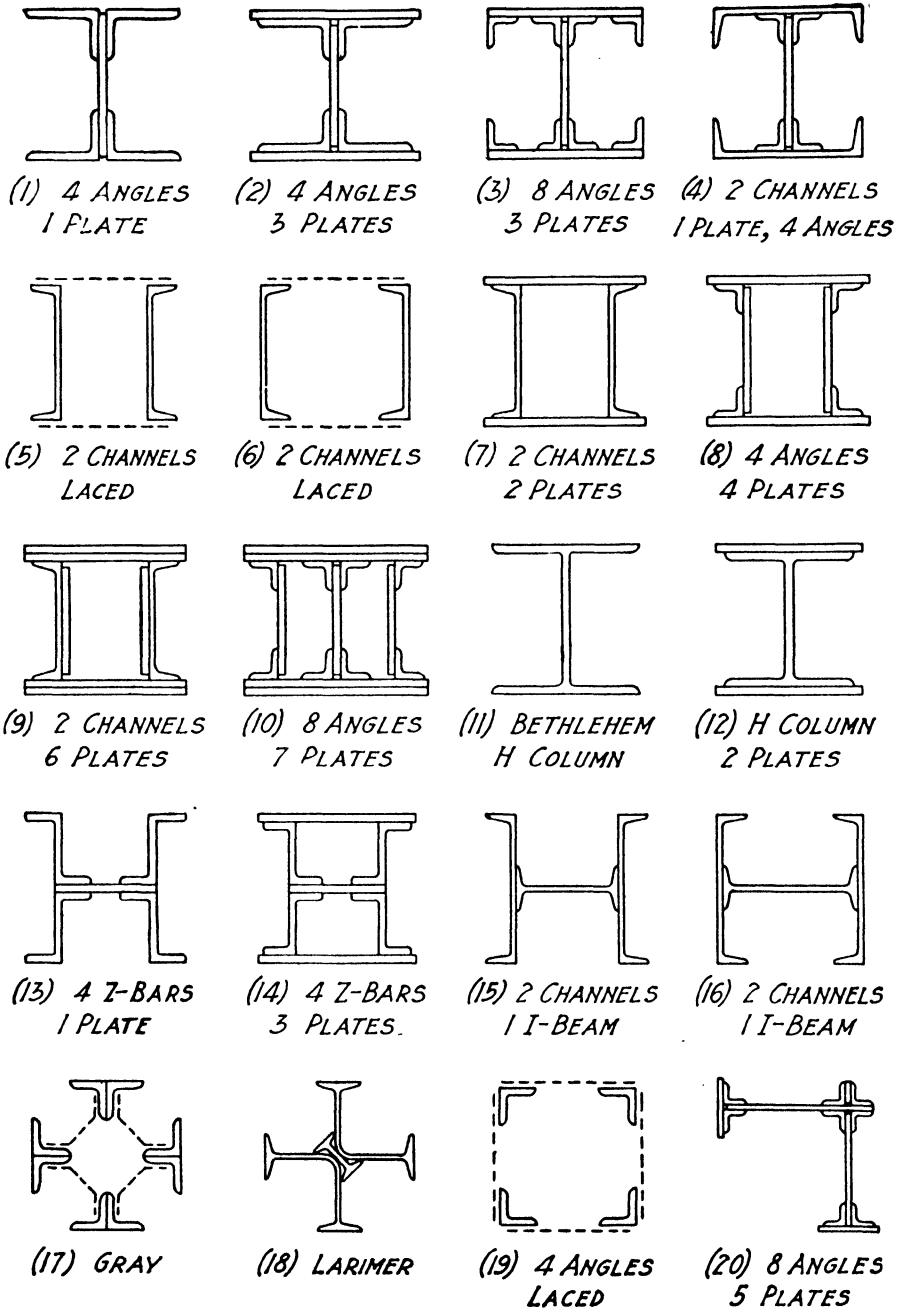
TYPES OF COLUMNS FOR STEEL BUILDINGS.
